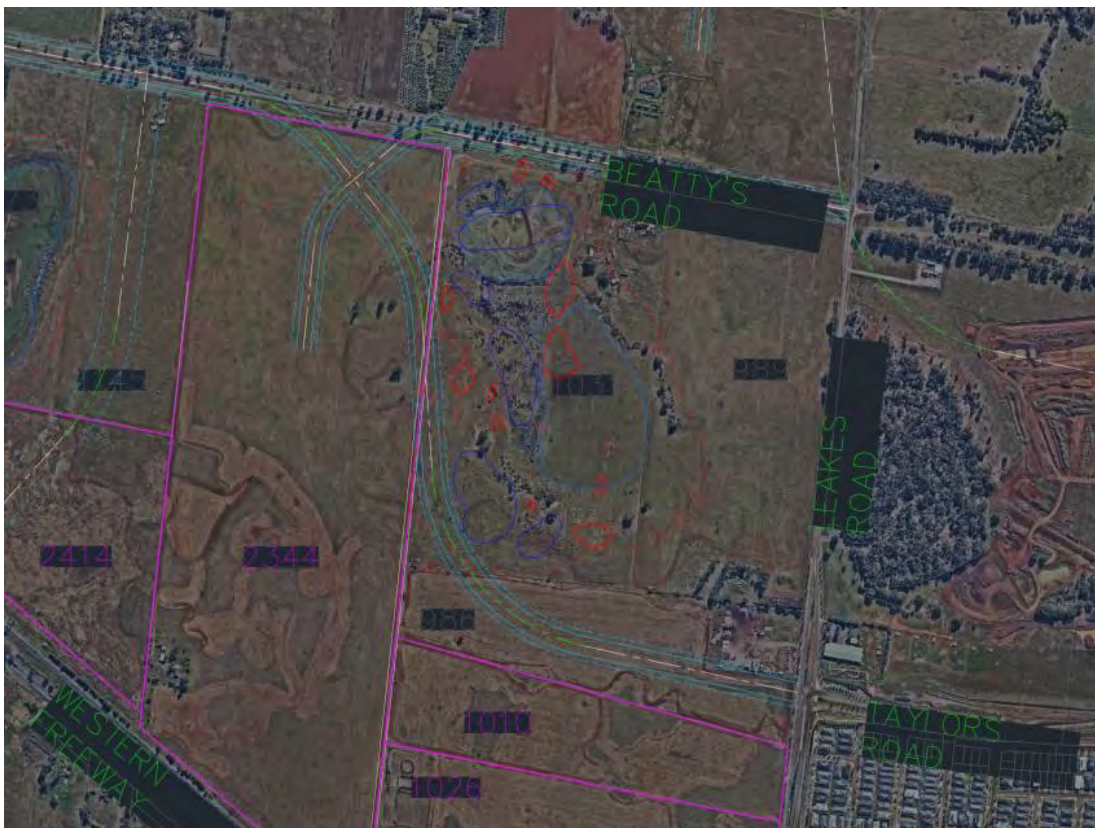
Taylors Road and Beatty's Road – Continuous radius through intersection.
